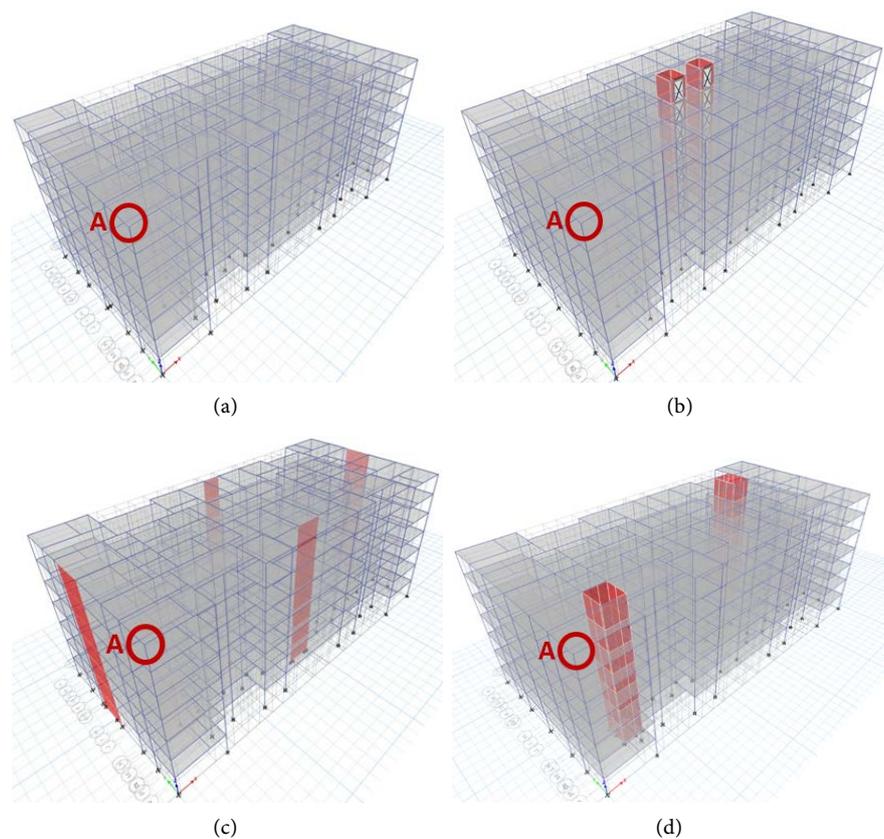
Different layouts of shear walls in the RC building. (a) No shear wall (Case-1); (b) Shear wall located near the center(Case-2); (c) Shear Walls distributed around the building (Case-3); (d) Shear wall located at two opposite corners (Case-4).
